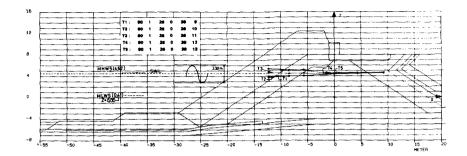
Cross-section of instrumented breakwater and example of wave damping
